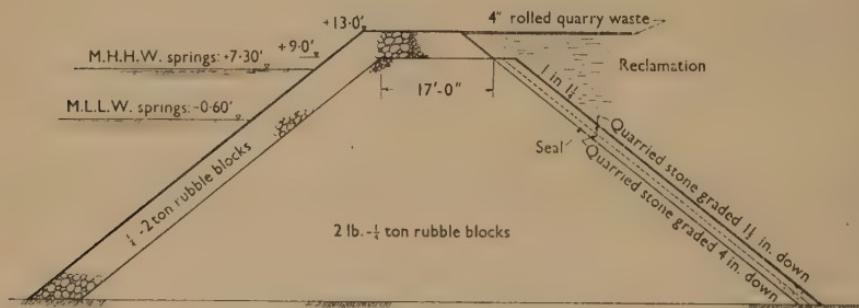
TYPICAL SECTION OF RUBBLE MOUND
